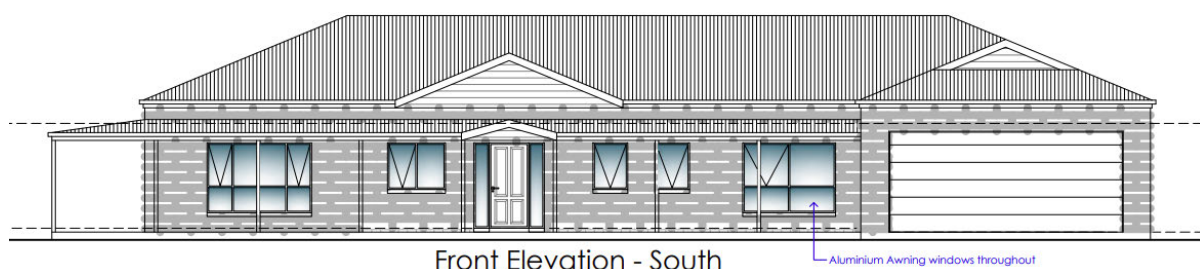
Plan of proposed development – image source from Proposal – Site Plan
